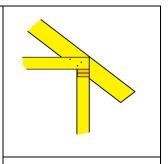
Typical rafter and ceiling joist connection with no soffit at eave.
